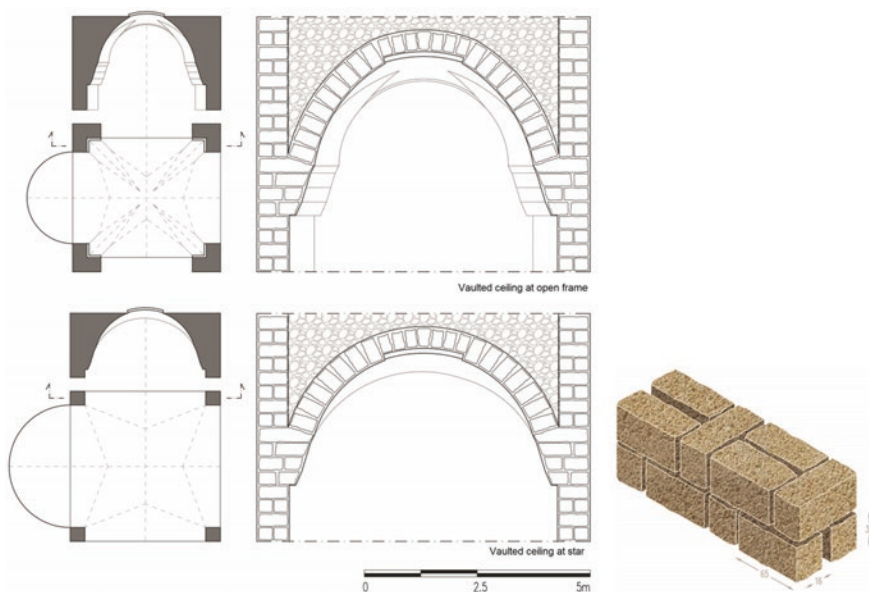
Construction technologies: vaulted ceilings in Lecce stone (left) and sample of the wall at full blocks (right)
